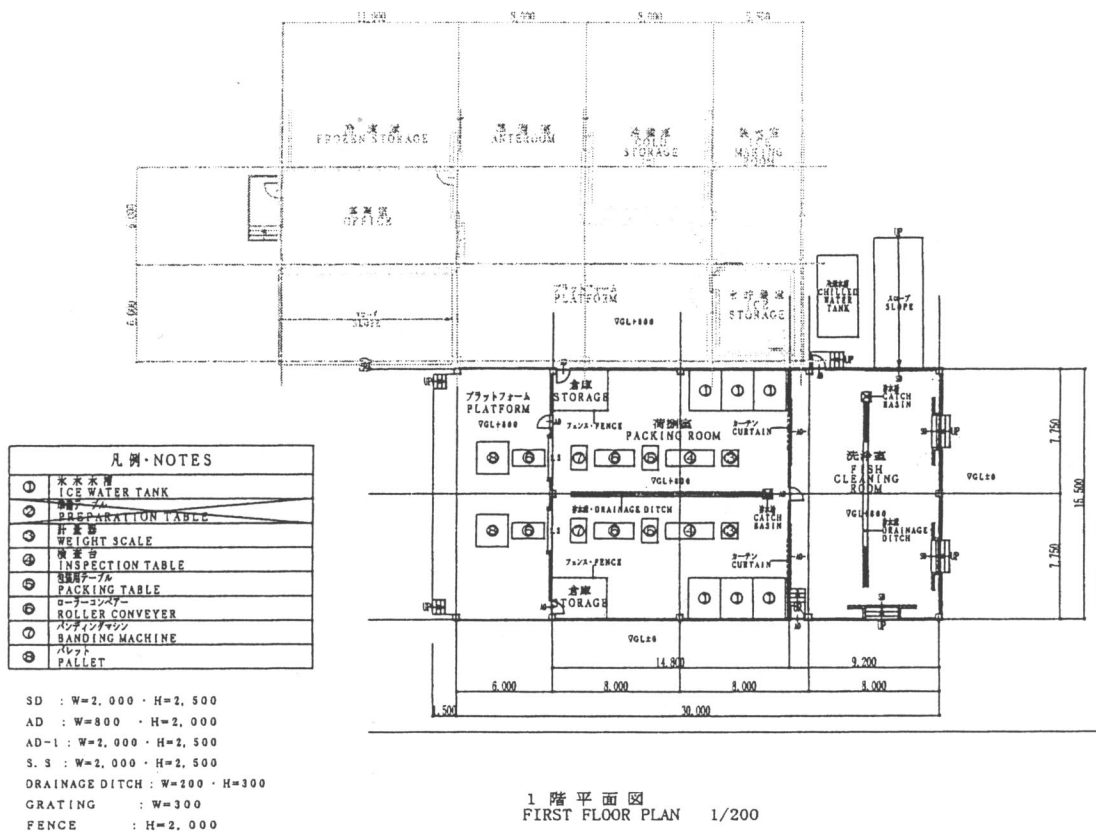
Layout Plan of the Tuna Transshipment Building
